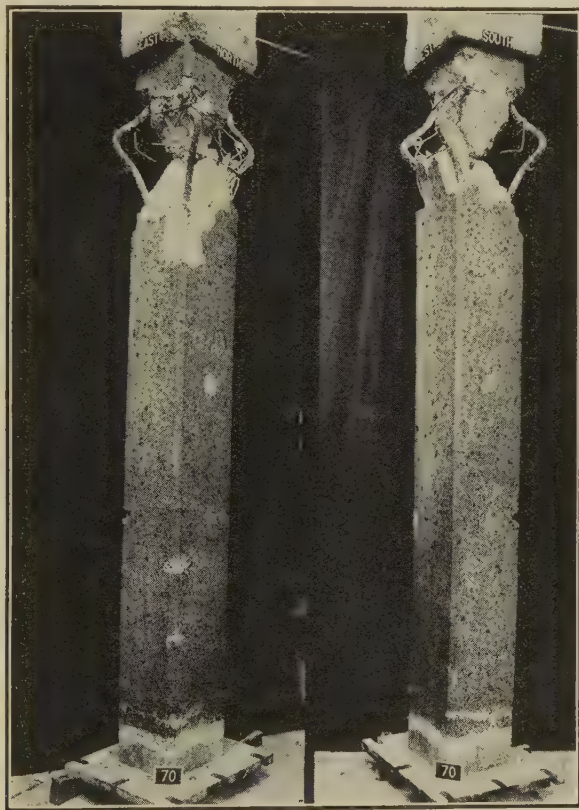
SQUARE VERTICALLY REINFORCED COLUMN: 1 : 2 : 4 CHICAGO LIME-STONE CONCRETE. AFTER 8 HOURS 40 MIN. EXPOSURE TO STANDARD FIRE CONDITIONS AND 3 TIMES ITS NORMAL WORKING LOAD.
